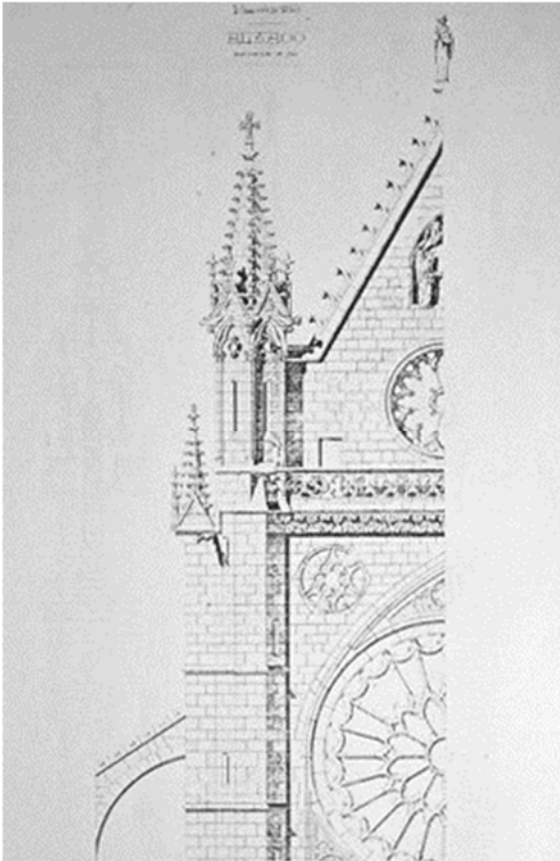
Catedral de León. Demetrio de los Ríos. Project chosen for the south façade, 1880.
